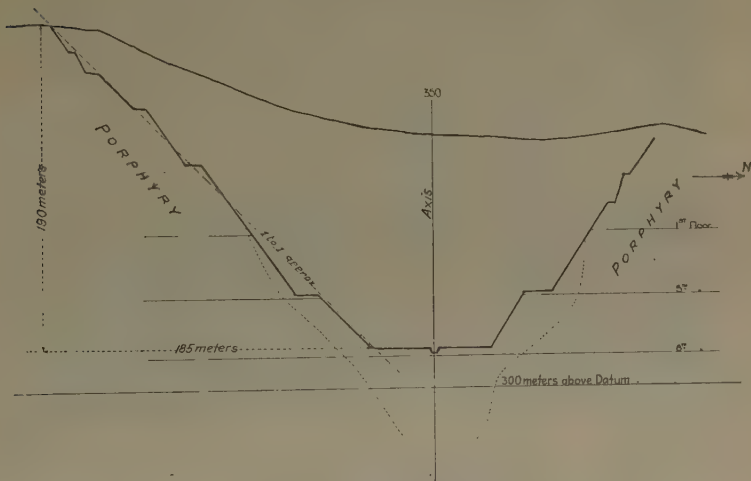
NORTH LODGE OPENCAST. CROSS-SECTION SHOWING BANK STOPES EXCAVATED BY HAND.
